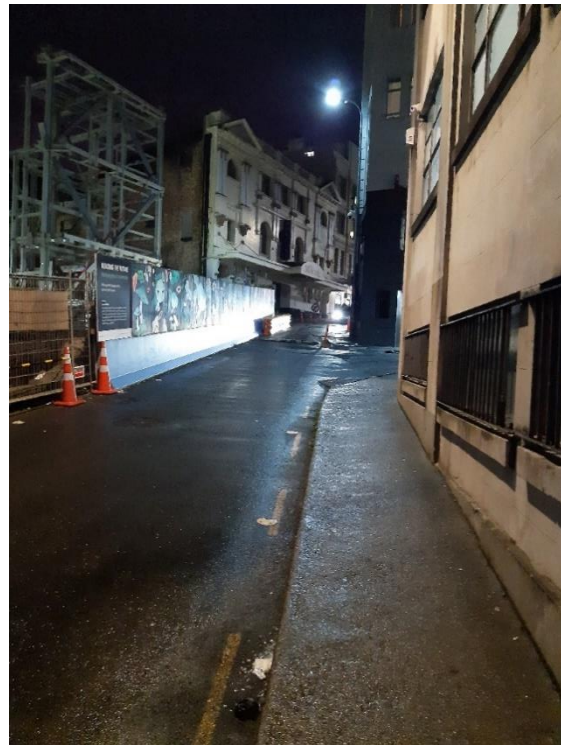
Looking north along Mercury Lane towards the intersection with Cross Street
